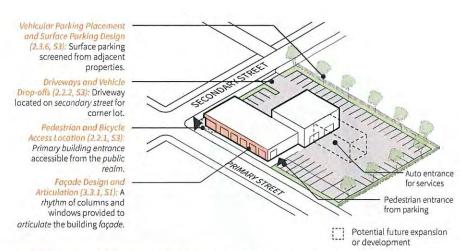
Small-Scale Dealerships or Auto Services - A small-scale dealership and auto-service center with screened parking and an articulated street-facing building façade. Vehicle access is provided from the secondary street and designed to not impede direct pedestrian access from the sidewalk.
